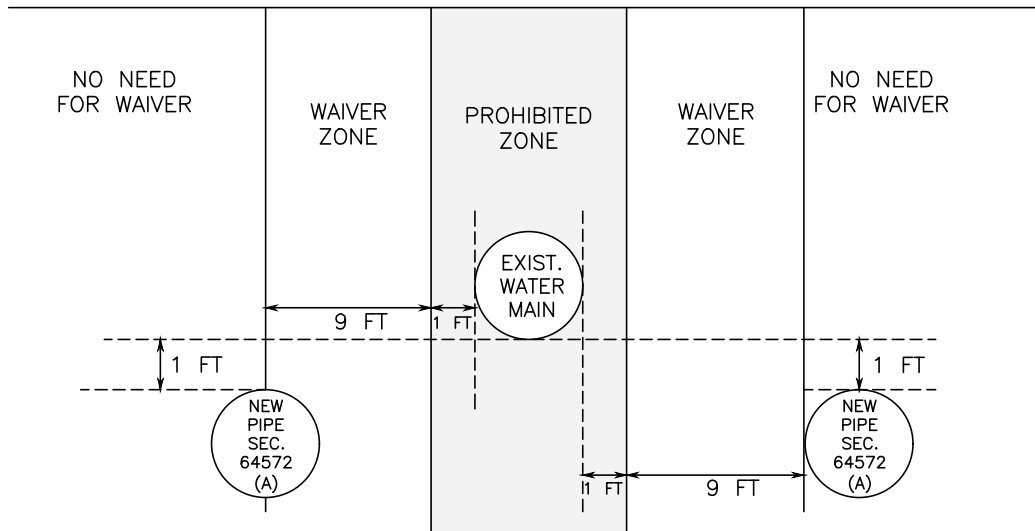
SECTION 64572 (a) UTILITY PIPE PARALLEL CONSTRUCTION
